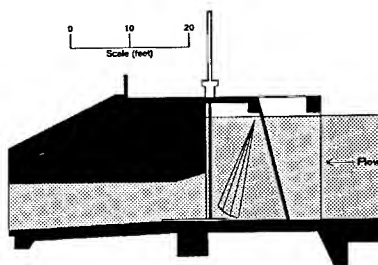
Cross-section of Kleber Dam intake showing location of transducer and sample volume.
